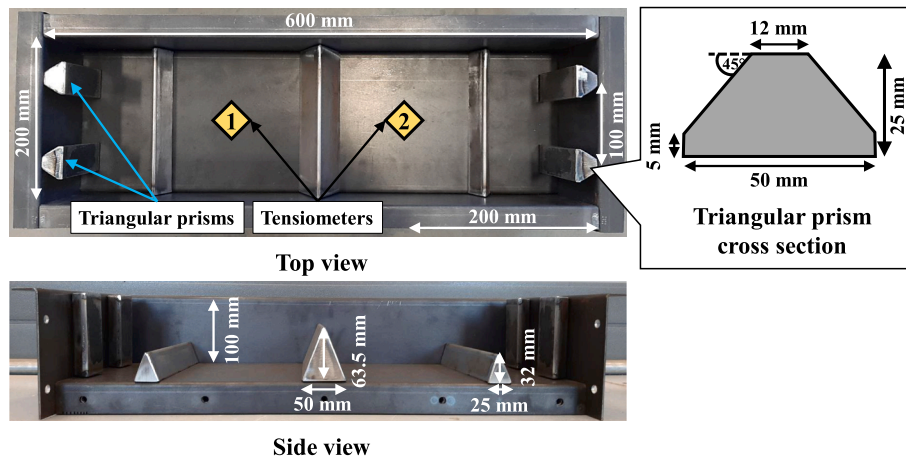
Plastic shrinkage cracking mould with dimensions and tensiometer placement.
